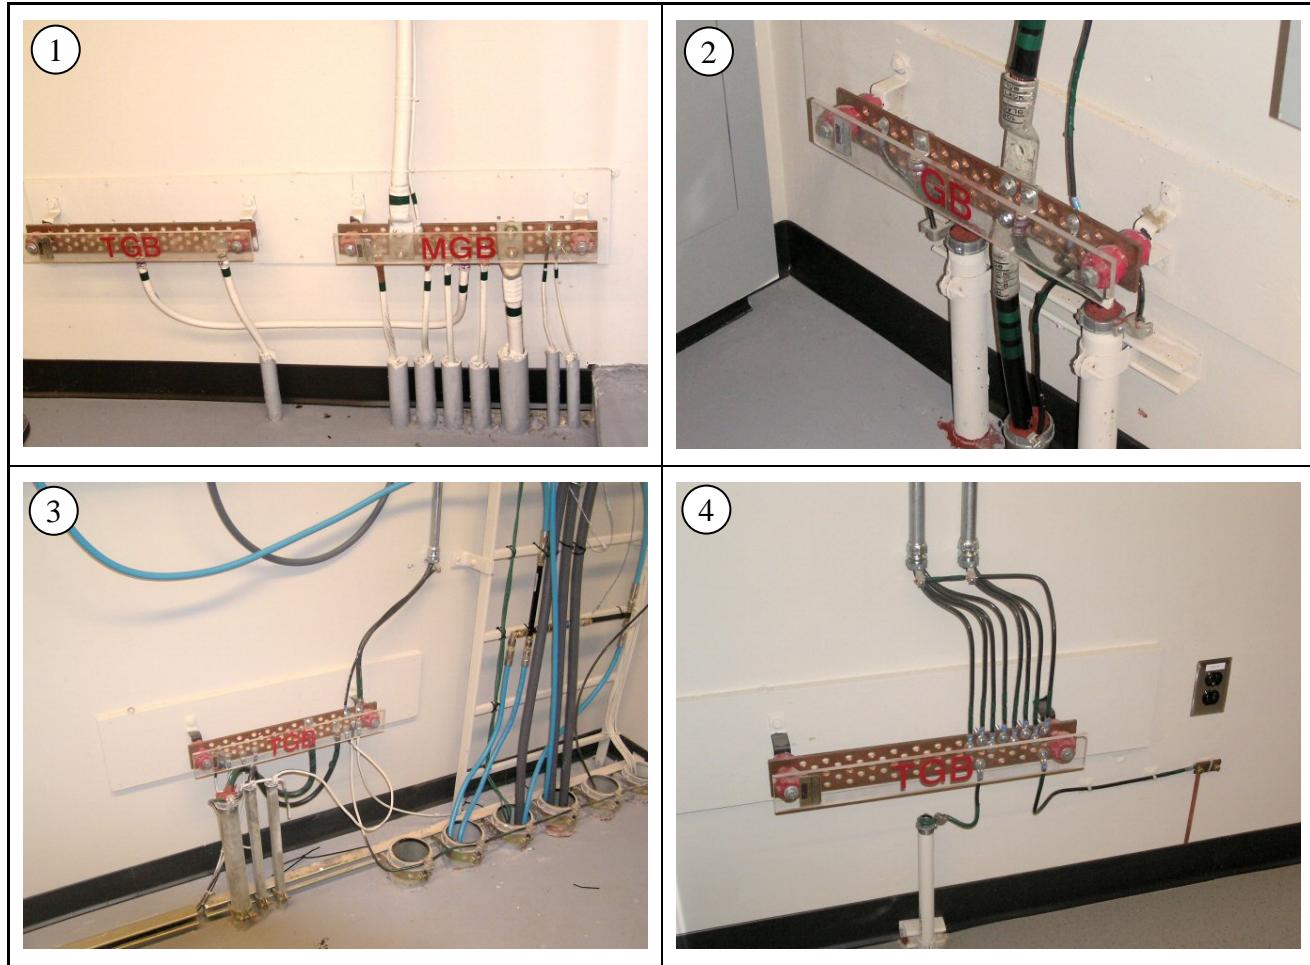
Equipment Room in Tall Building with Building Ground Bar System
